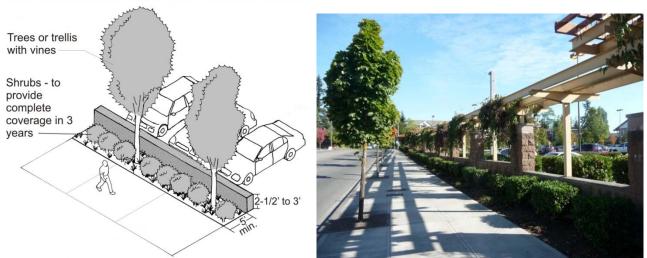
D.2.m. Parking area planting buffer with low wall and landscaping. Illustration with trees (left) and example with trellis (right).
